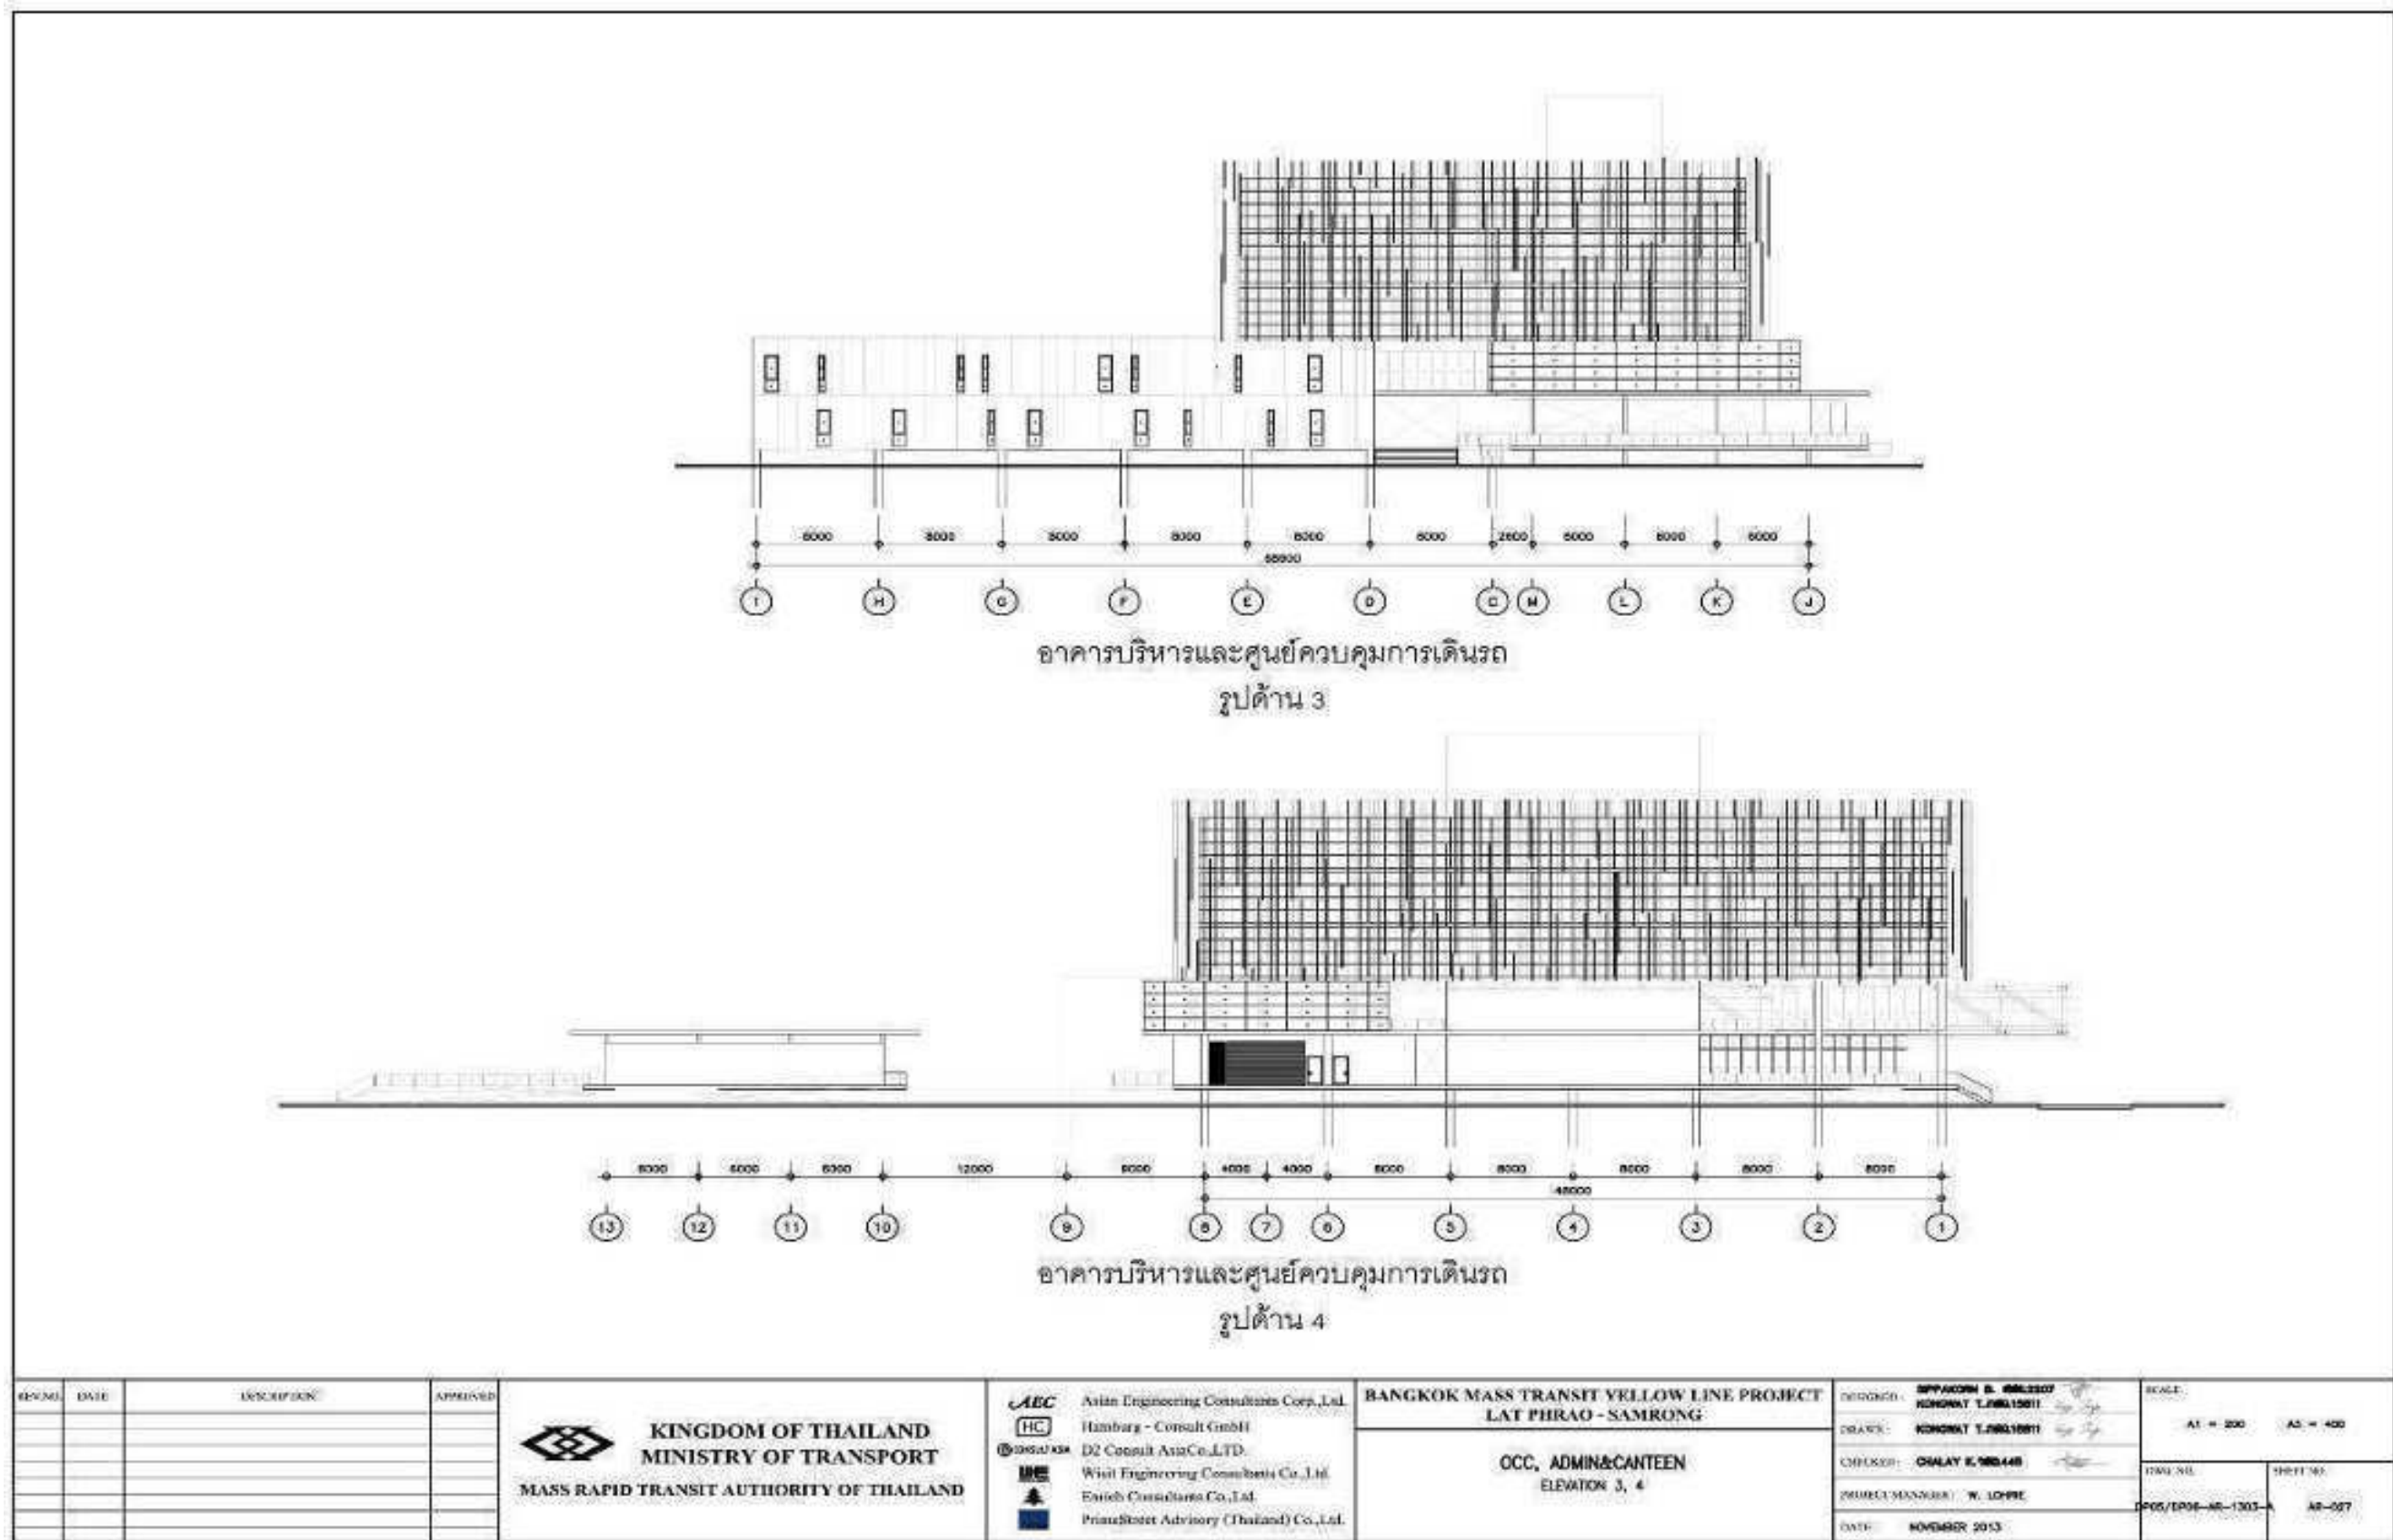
2 Detailed layout plan of Depot compositions (16/16)
